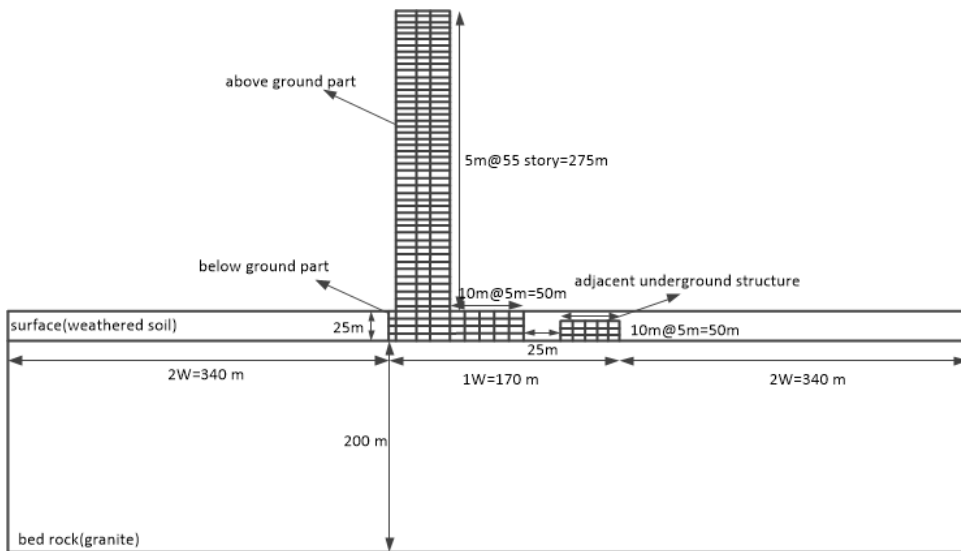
The analysis section of 55 story a high-rise building with adjacent underground structure
